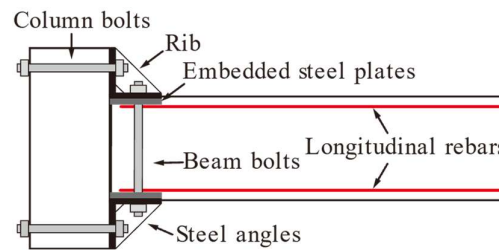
Joint connection utilizing strengthened steel angles and high-strength bolts
